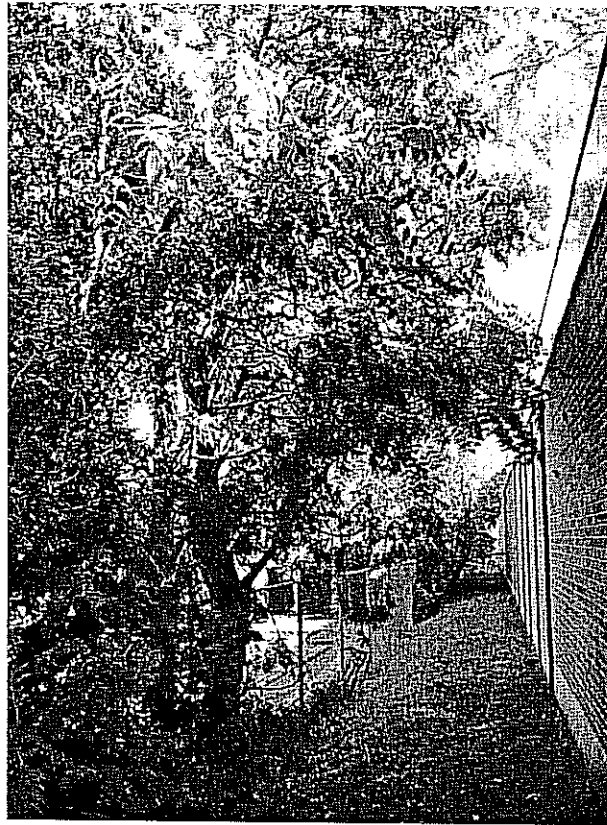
Area for Proposed Walkway for Condo Entrances and Office Rear Doors
